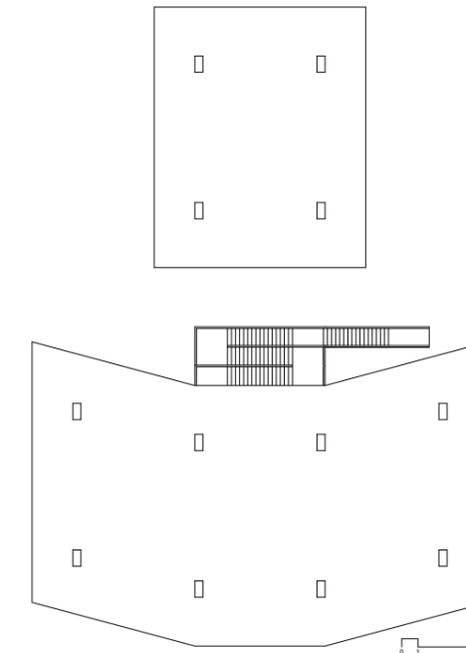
Ökohäuser, Frei Otto standard floor plans
